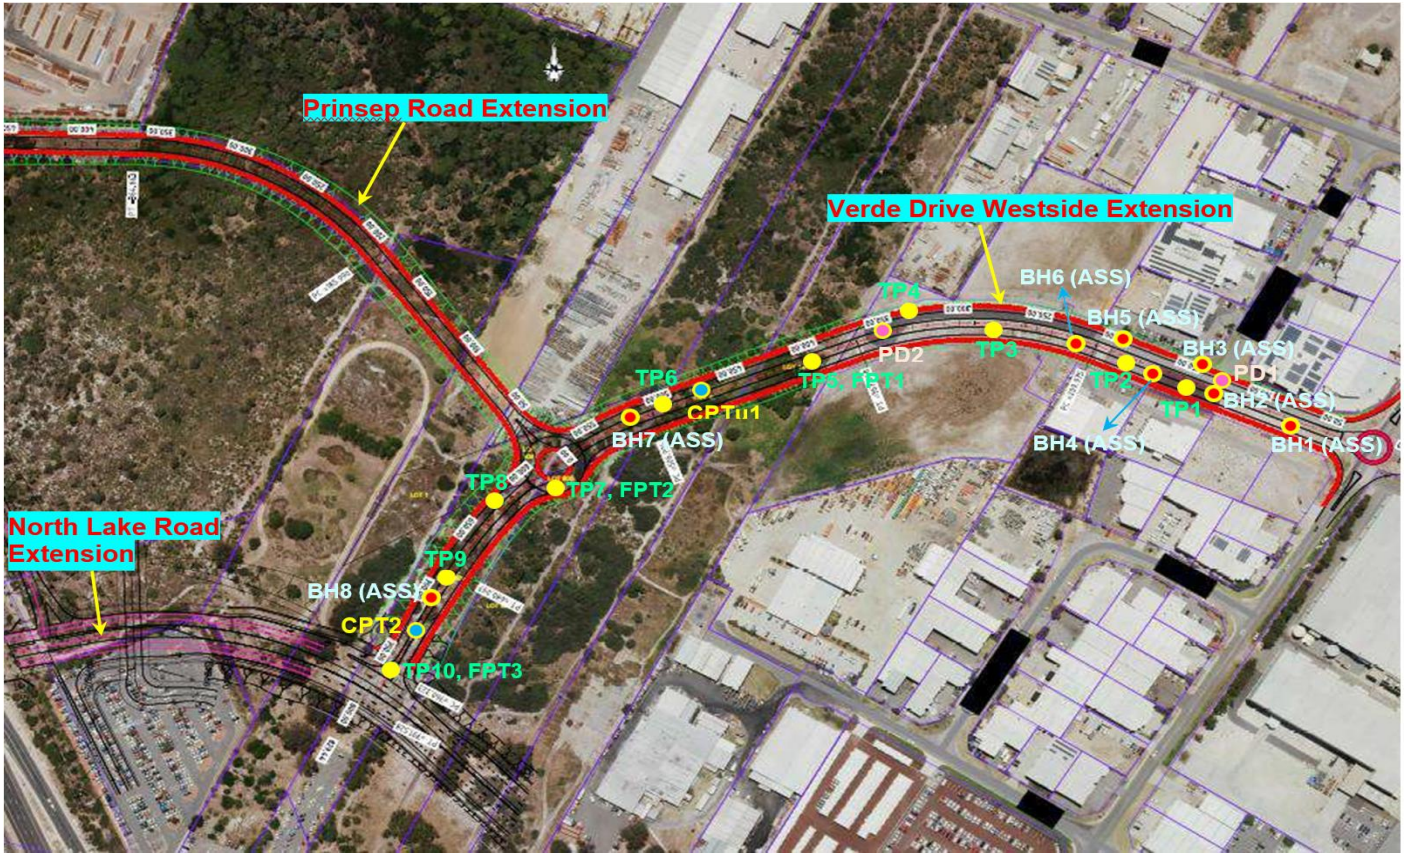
Geotechnical and Pavement Investigation for Verde Drive Westside Extension
